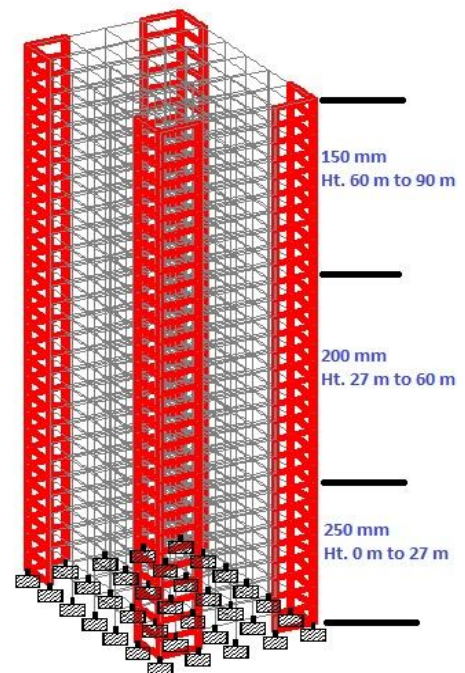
D View of Frame with Position of Stepped Shear wall
